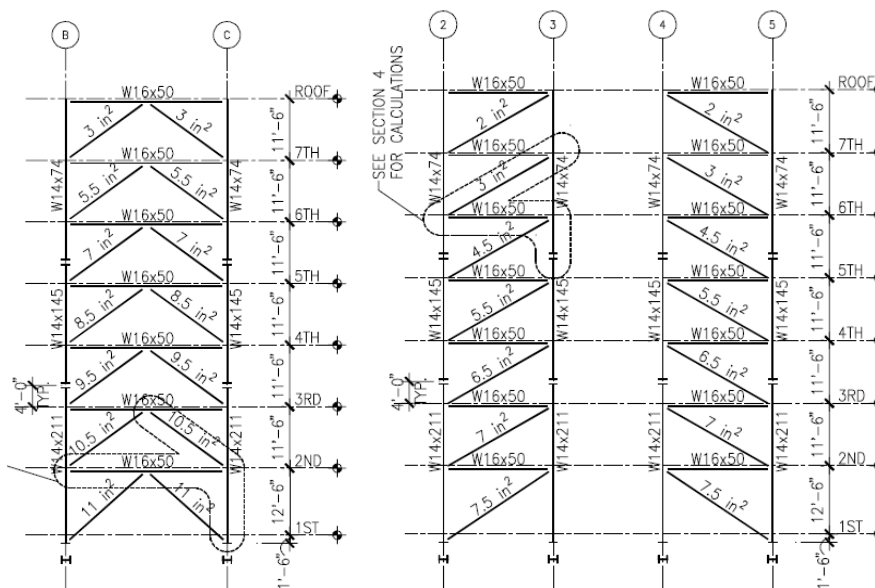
The elevation view of BRBF building. BF-1(left) and BF-2(right) [31].
